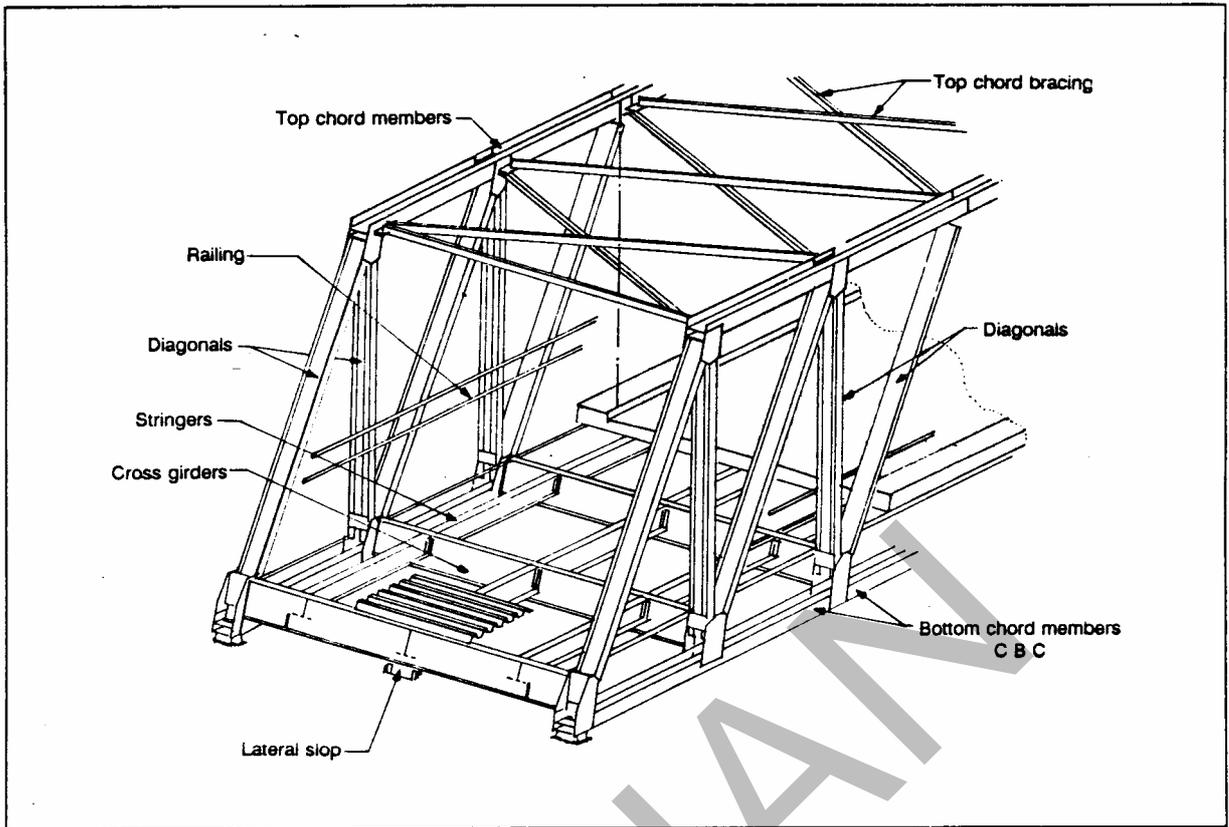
Austrian Permanent Truss - Typical Cross Section
